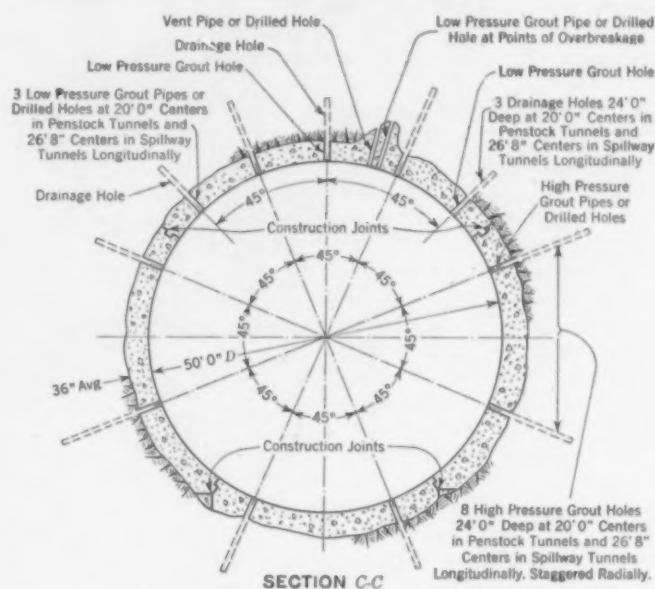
TYPICAL SECTION THROUGH TUNNELS SHOWING HOLES FOR LOW- AND HIGH-PRESSURE GROUTING AND FOR DRAINAGE
